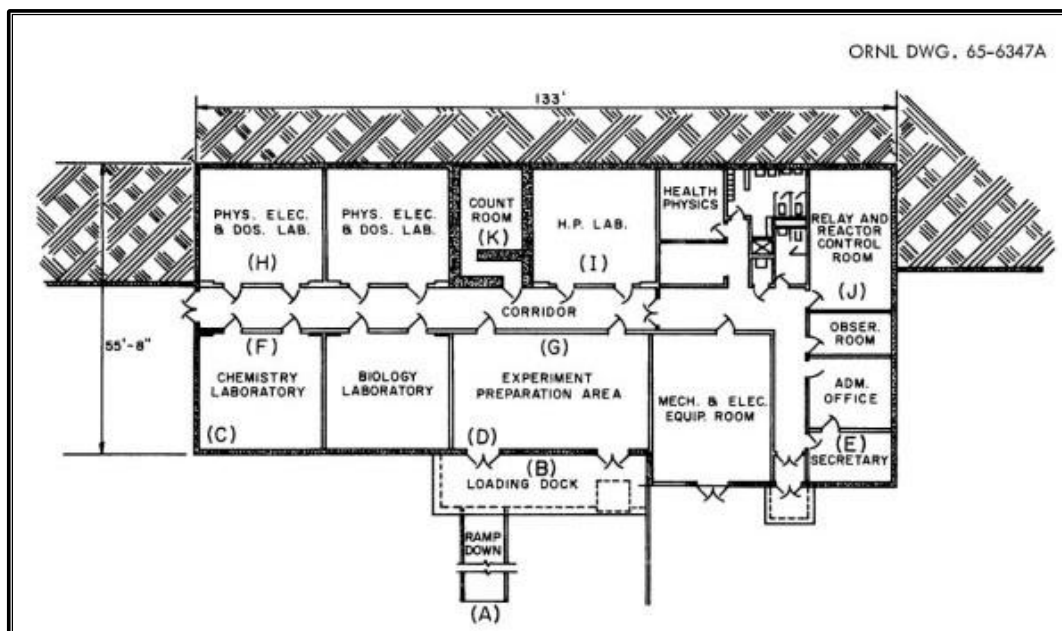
Floor plan of the DOSAR Control and Laboratory Building (Building 7710), 1968.
